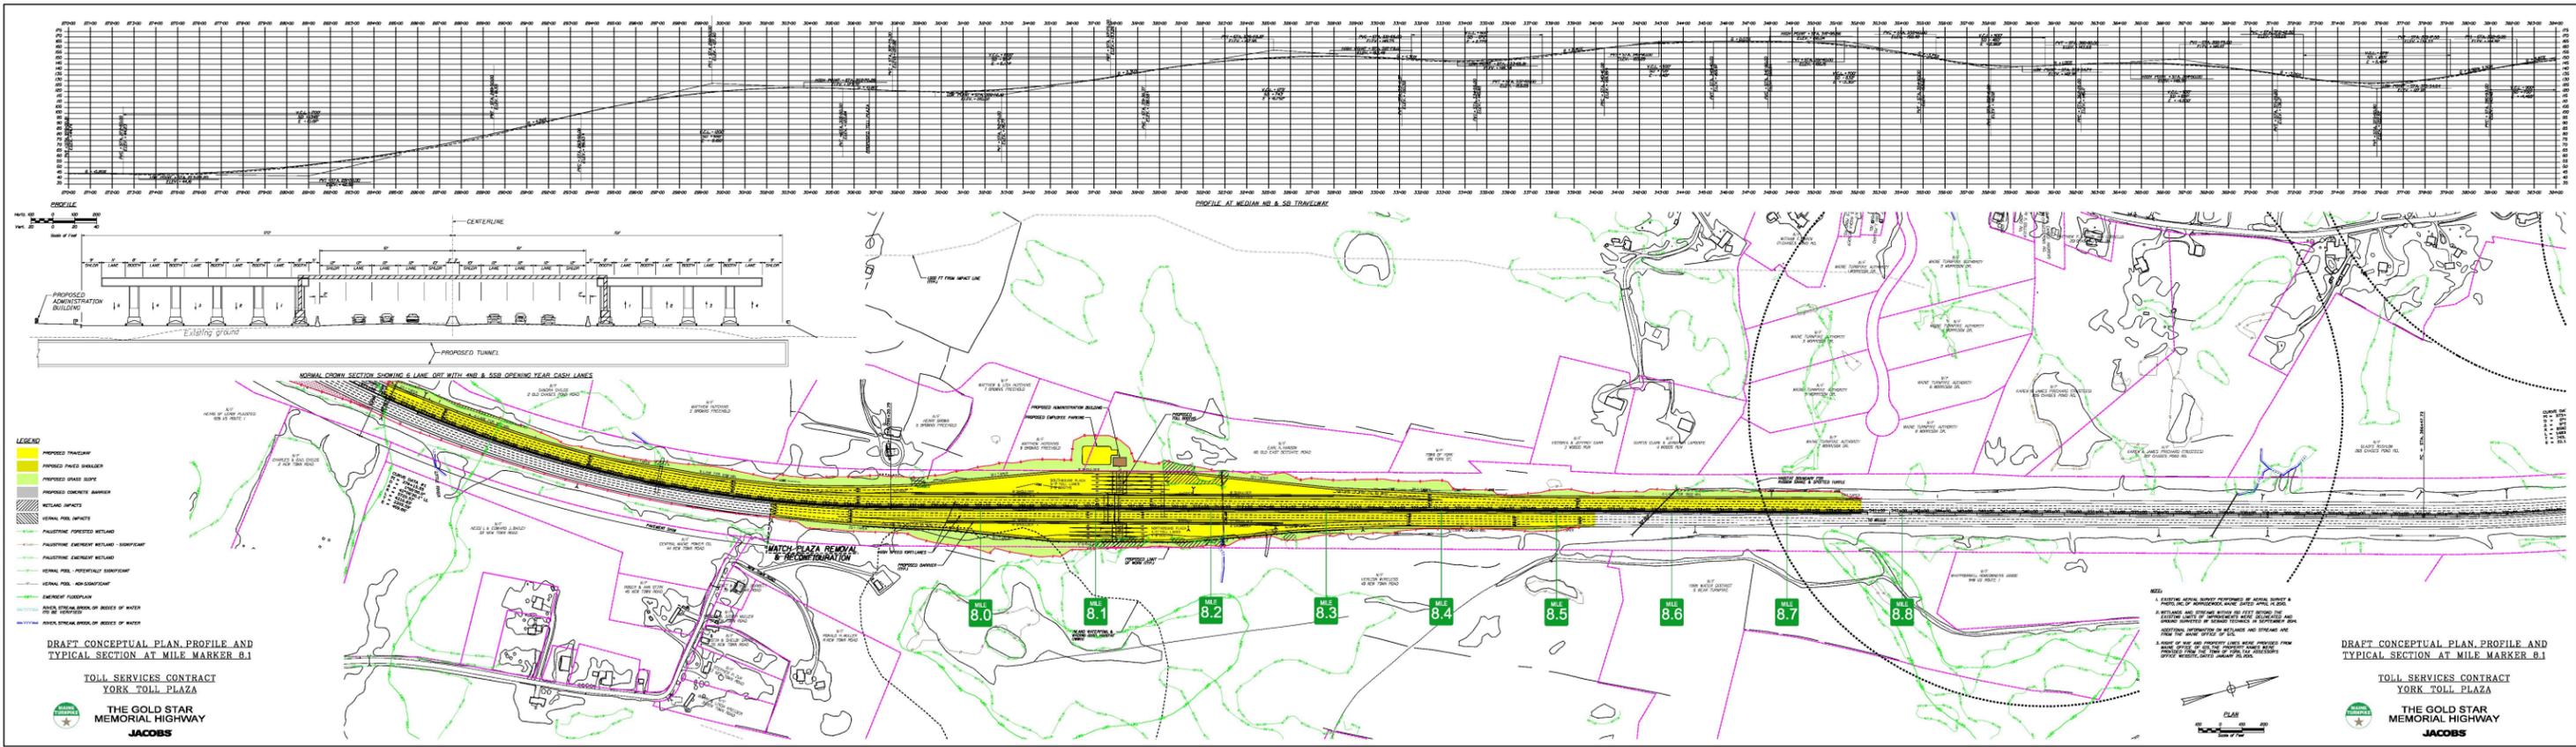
Conceptual Plan, Profile and Typical Section at Mile 8.1
